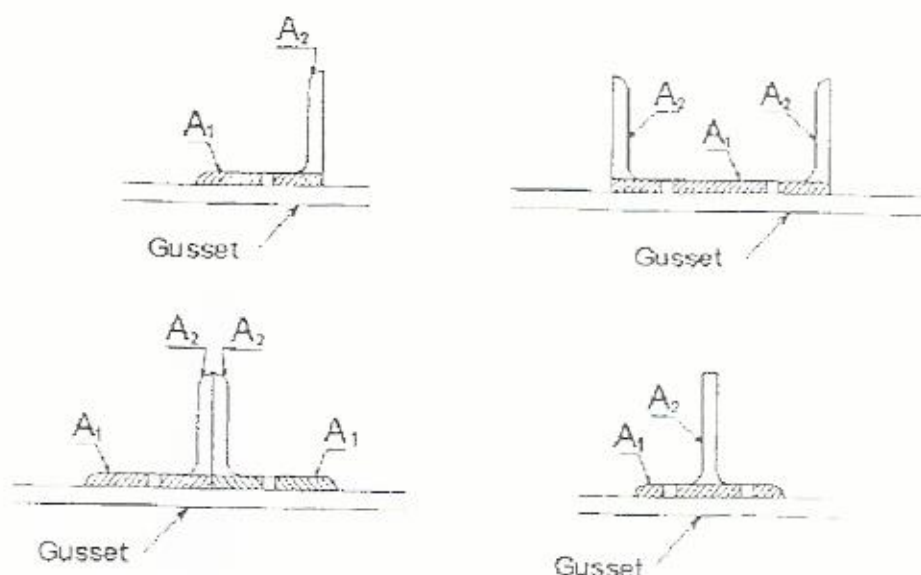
Single Angles, Channels and T-Sections Connected to Gusset Plates
